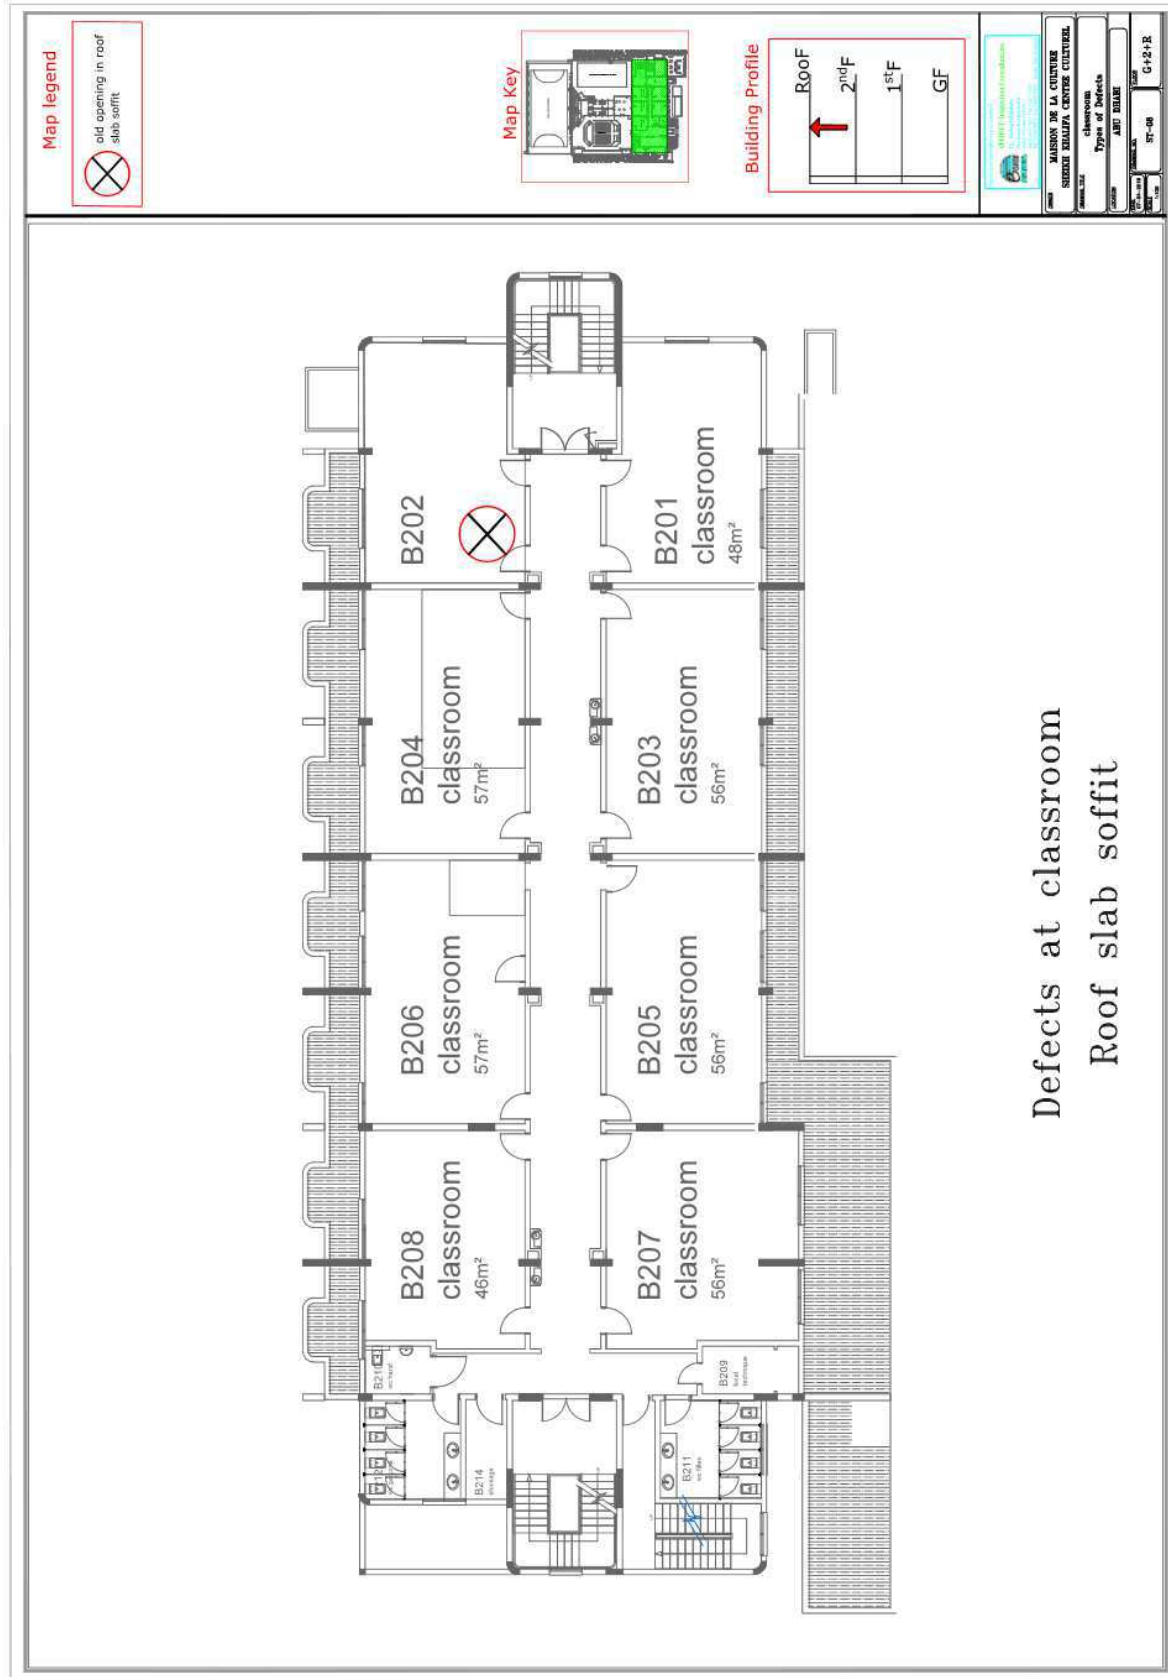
defects in Classroom building in roof slab soffit
